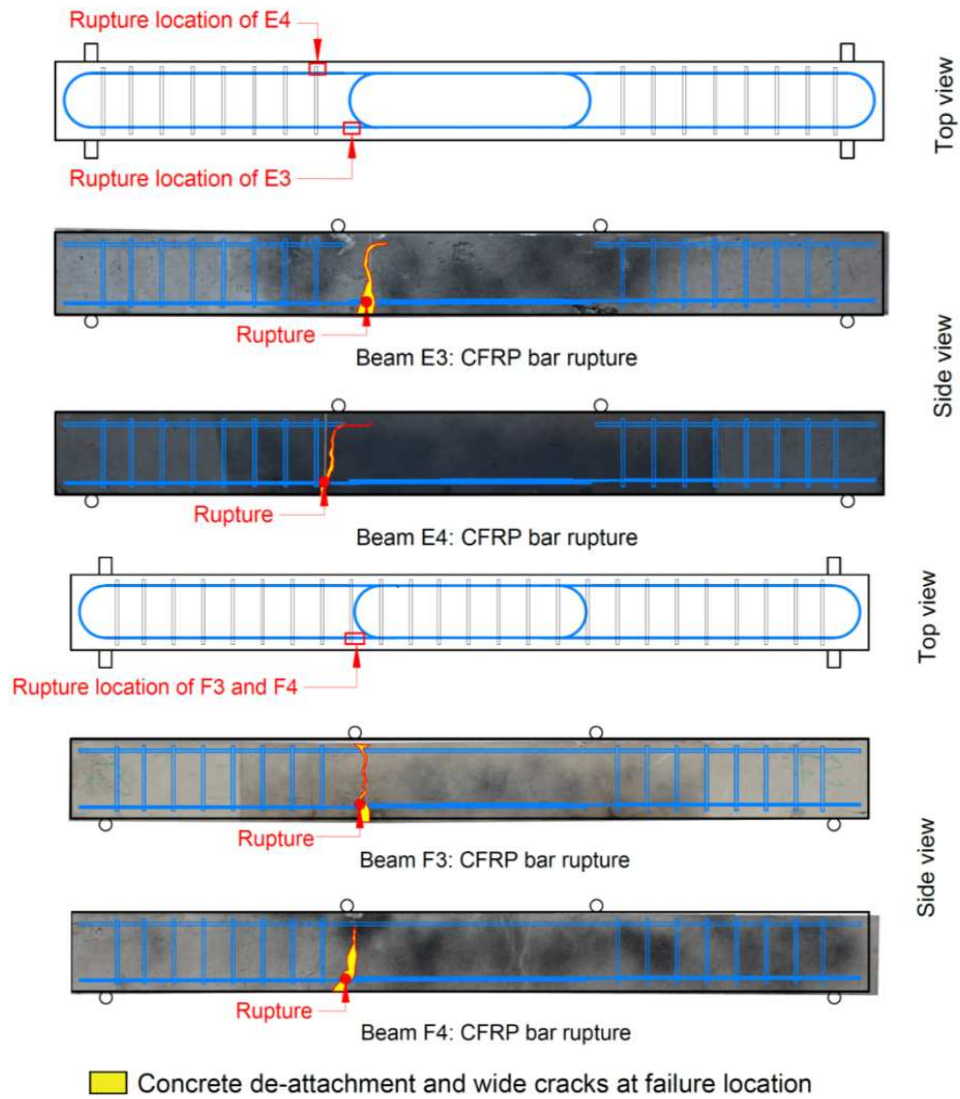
Failure zone and mechanism for beam specimens with CFRP loops at elevated temperatures.
